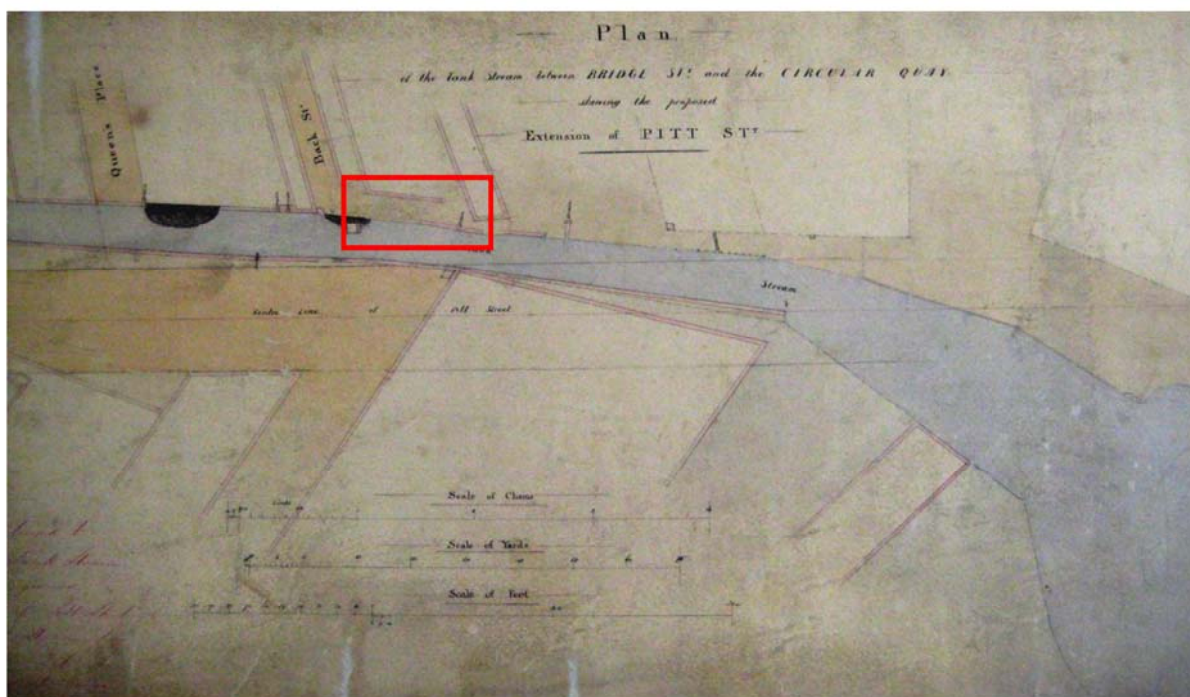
Part of an undated plan (c1847-c1854) for the proposed extension of Pitt Street. The unidentified structure near Back Street (Underwood Street) appears to be a small embankment, possibly an embankment for a bridge later built by Mr Underwood. Various drains exit from private properties into the Tank Stream. The red box indicates the location of the study area. Item S6-203/1, NSCA Series 521, CCSA.
